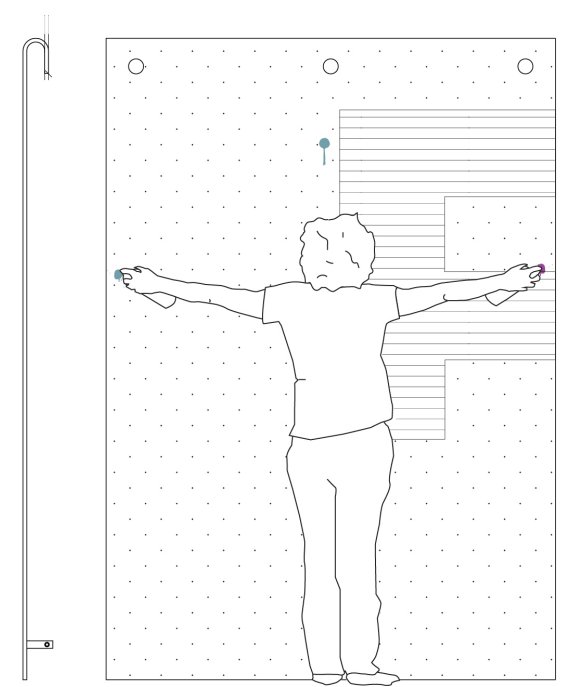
Elevation of Wall_001 Panel, Artist arms indicating mural size
